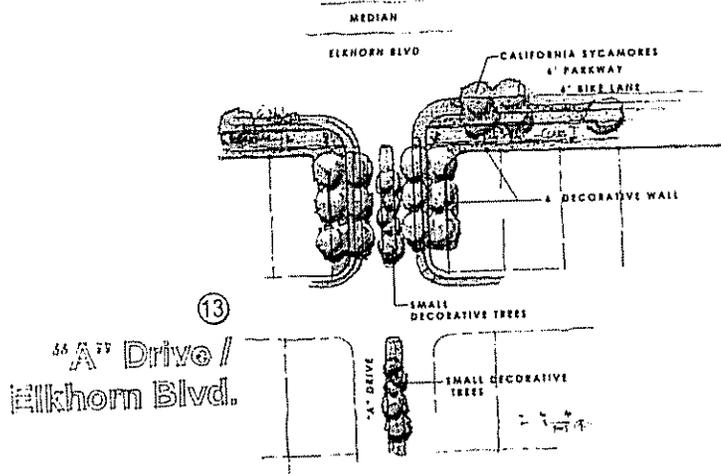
Schematic Landscape Plan 13. A Drive at Elkhorn Boulevard.
